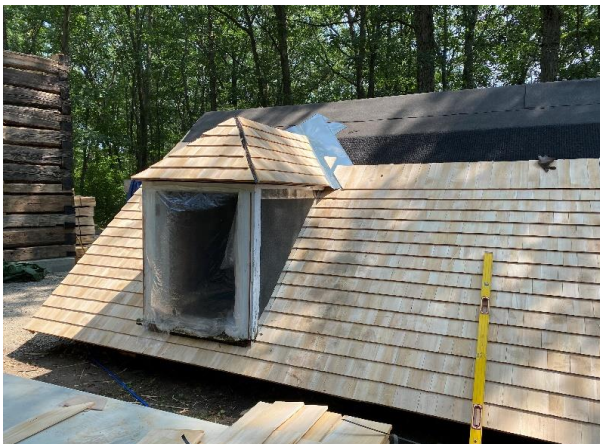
The decaying cedar shingles of the cabin roof structure (which remained intact from its move from Canatara Park) were stripped, new weather proofing applied, and new Ontario-sourced cedar shingles installed.
